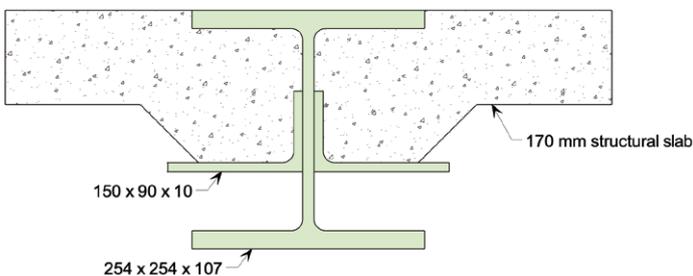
Cross-section through a 254 x 254 UC beam and 150 x 90 shelf angles supporting a composite slab with decking supplied with crushed ends
